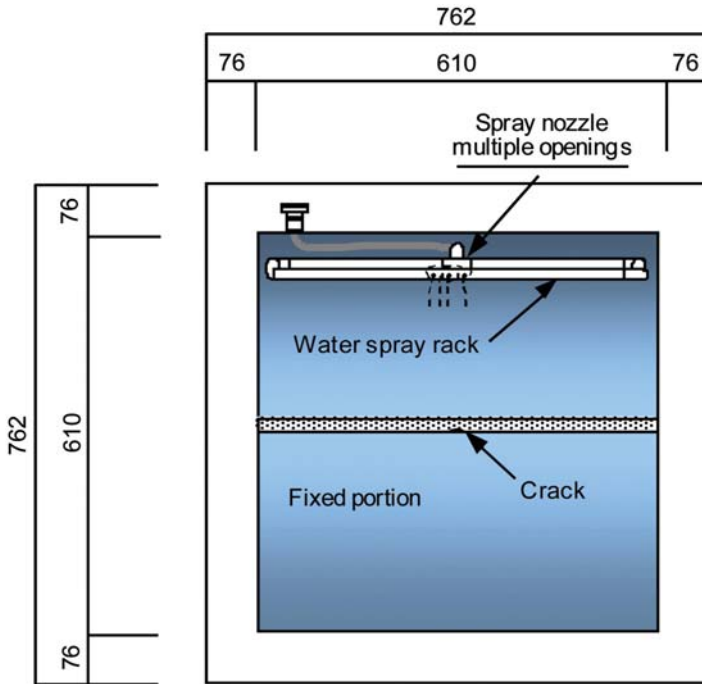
Front elevation of test specimen showing horizontal joint, location of crack in joint.
